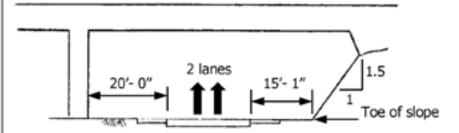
Bridge elevation view of horizontal clearances for a 2-lane highway feature with 1way traffic below the bridge.
